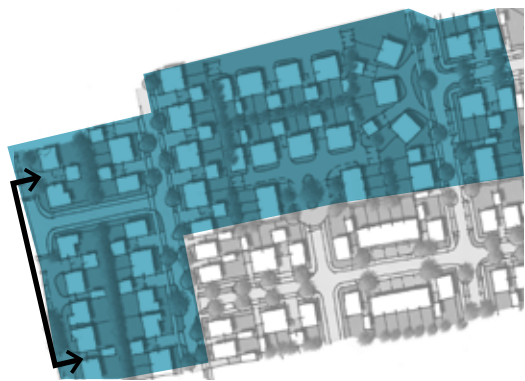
'COOL' ELEVATION LOCATION PLAN
